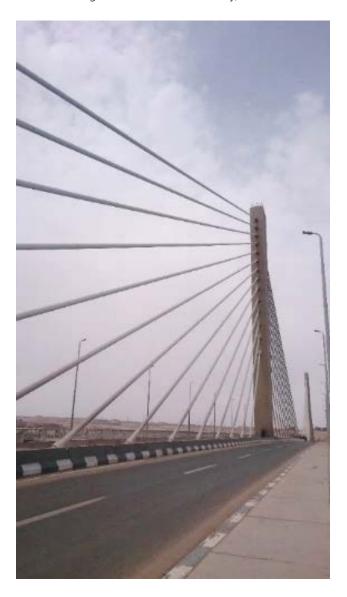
Figure XV: New Aswan Cable- stayed Bridge, 2017.
